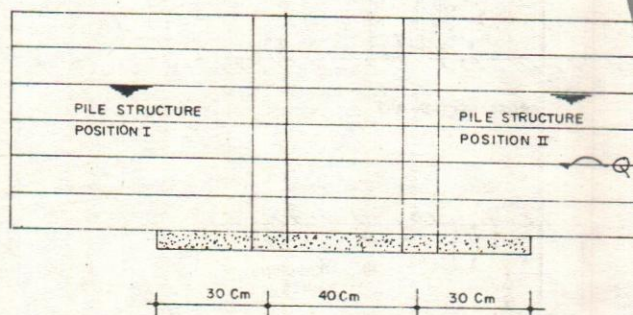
POSITION OF PILE STRUCTURE IN THE SAND PIT
